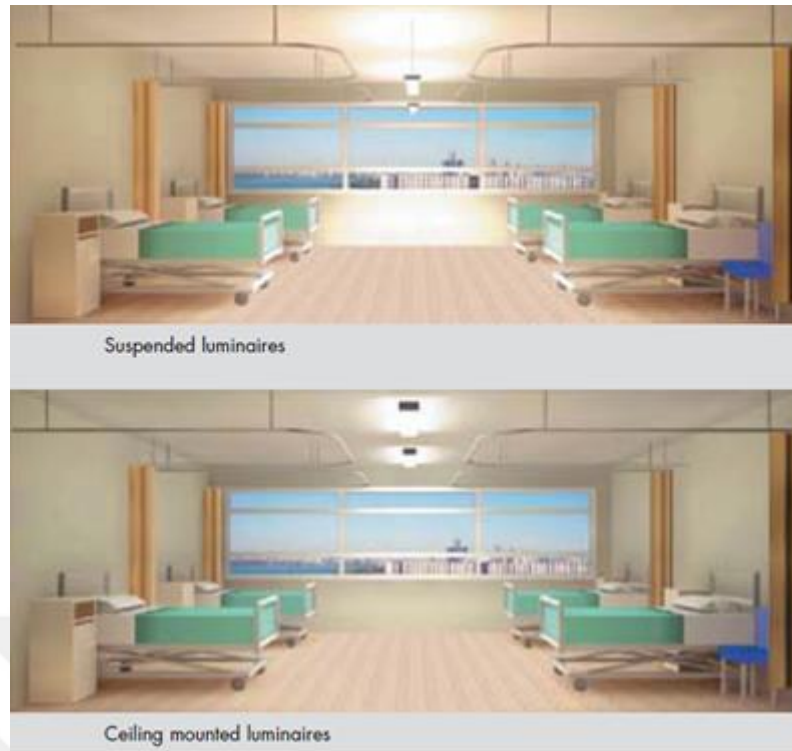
Suspended and Ceiling Mounted Luminaires
